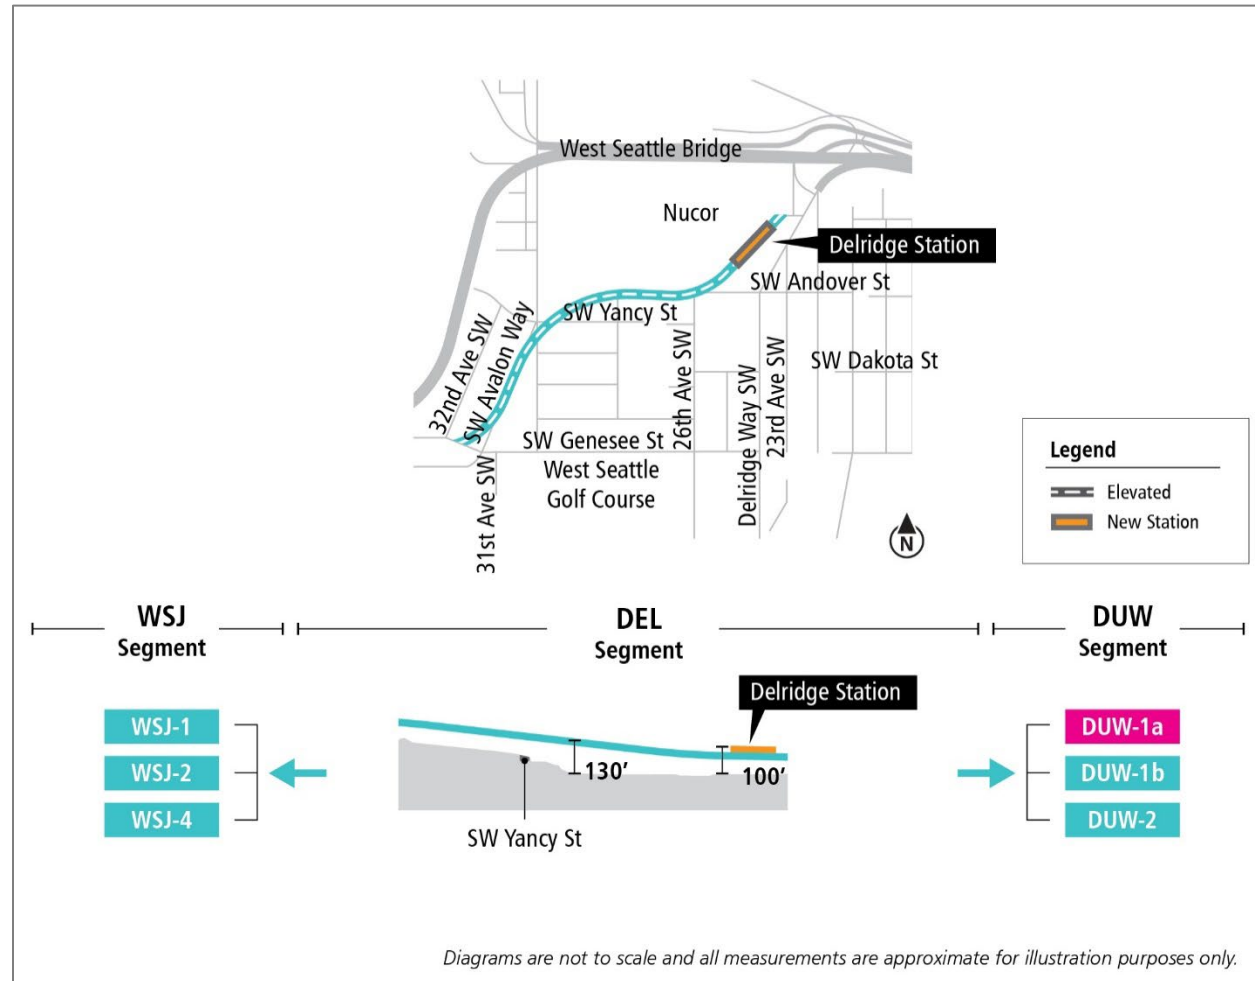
Plan and Profile for Delridge Way Station Lower Height Alternative (DEL-4)
